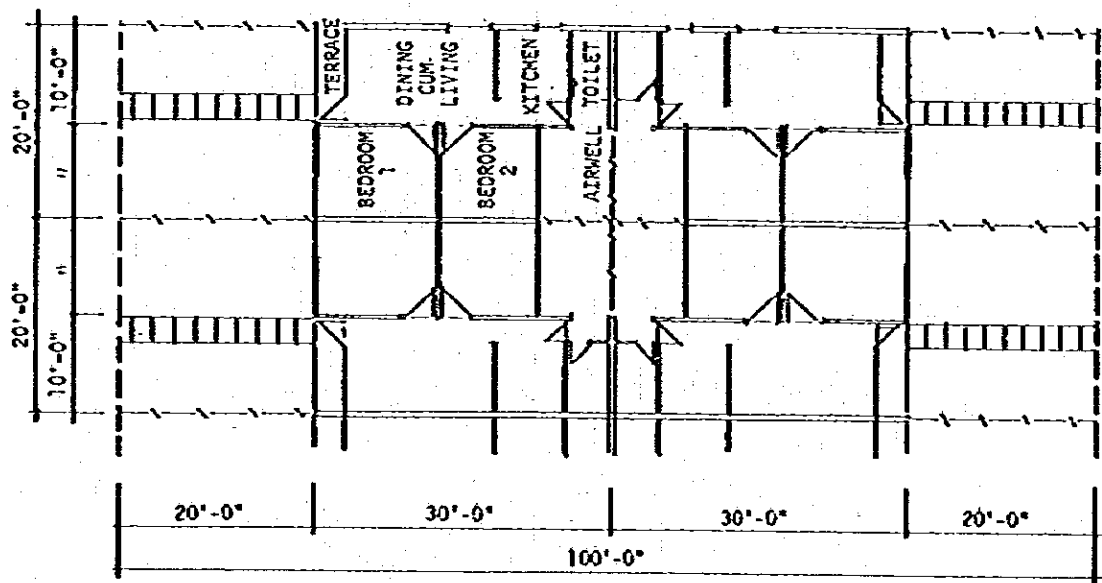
Floor Plan of Single story Cluster-Link Terrace House at Kg. Konggo
